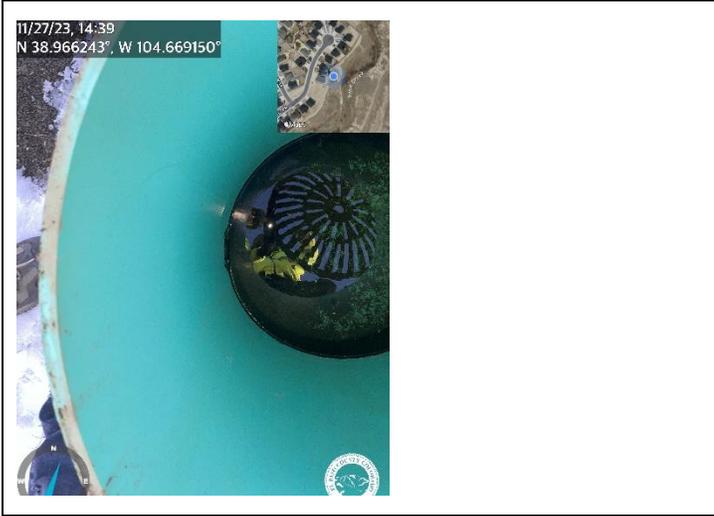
Missing orifice plate on North and South Sand Filter Basins. Not installed as per Homestead 2 Sand Filter GEC Plans sheet 8 of 8.
